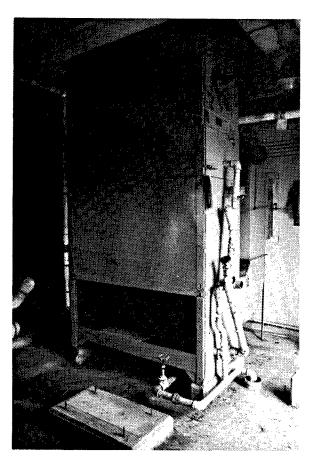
Building 6804-9: Air conditioner manufactured by Carrier Corporation in this Rest House.
